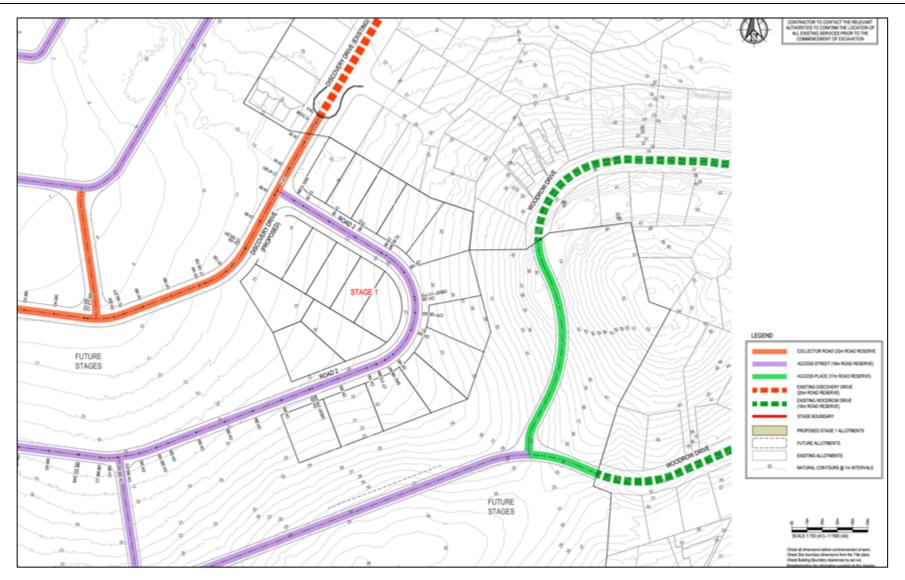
PROPOSED ROAD HIERARCHY PLAN (STAGE 1)
